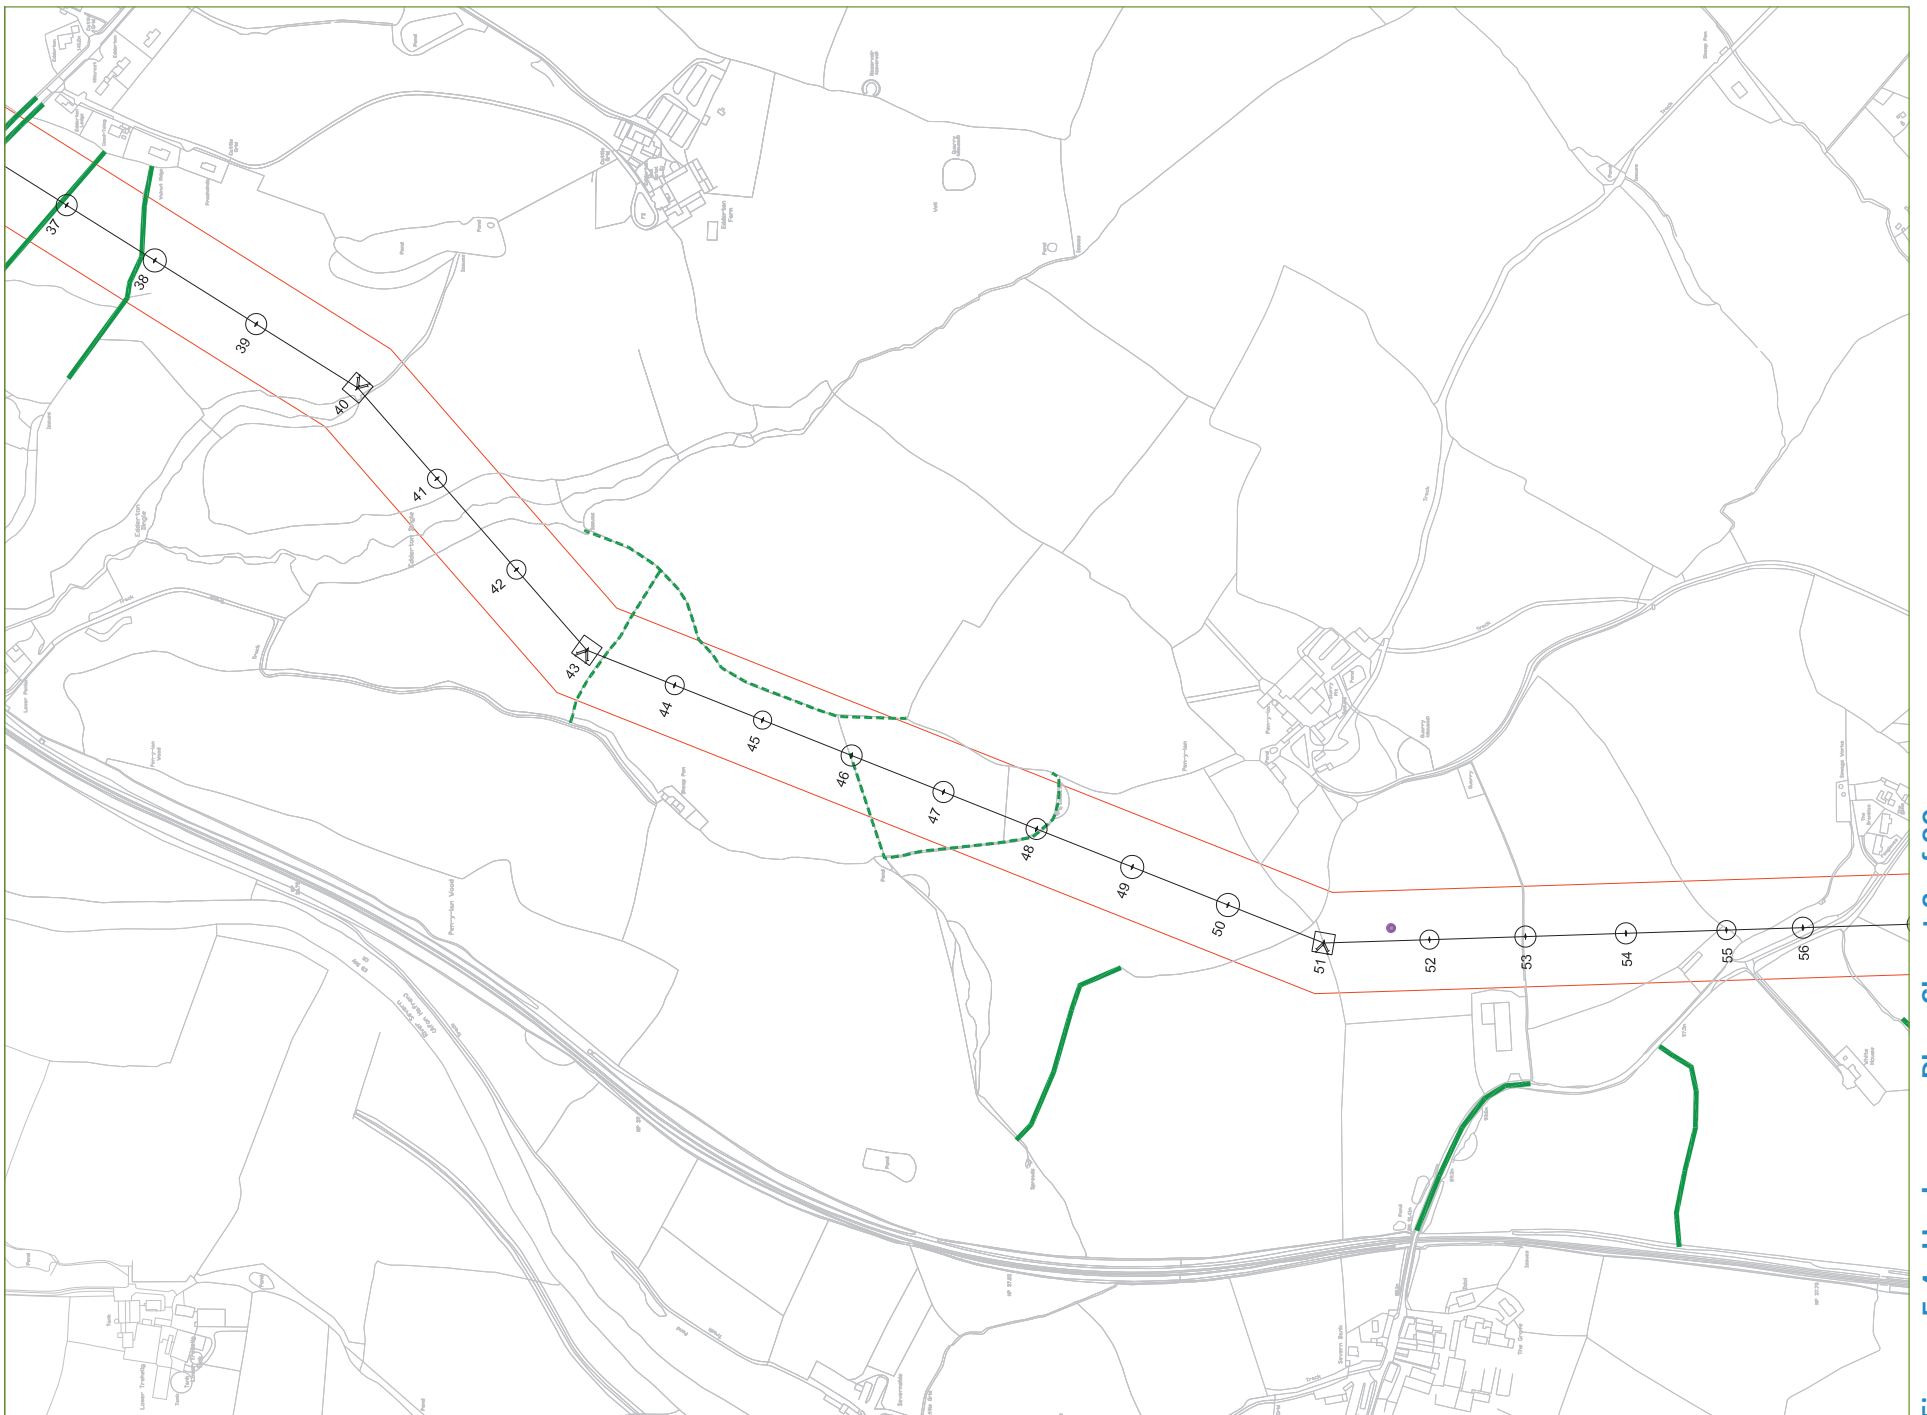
Hedgerow Plan Sheet 3 of 20
